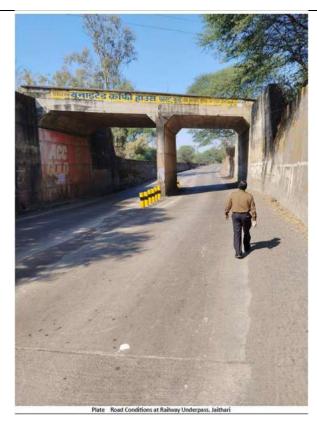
Issues Related to Road Conditions (Congestion inside Anuppur town, Narrow width of Rail Overbridge, Presence of Liquor Shops and Roadside Eateries near Jaithari roundabout, Encroachment and Hapazard parking at Khootatola T-point)
